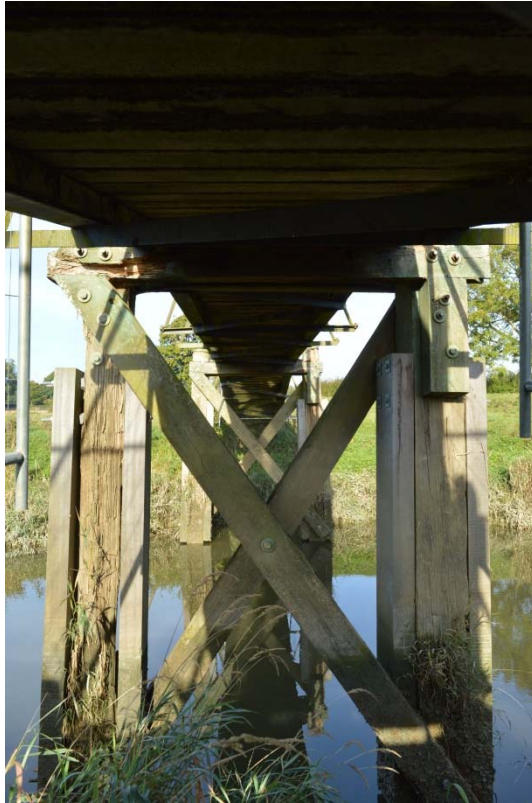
Timber piles supporting the main span of the bridge (#EFO16-0037)
